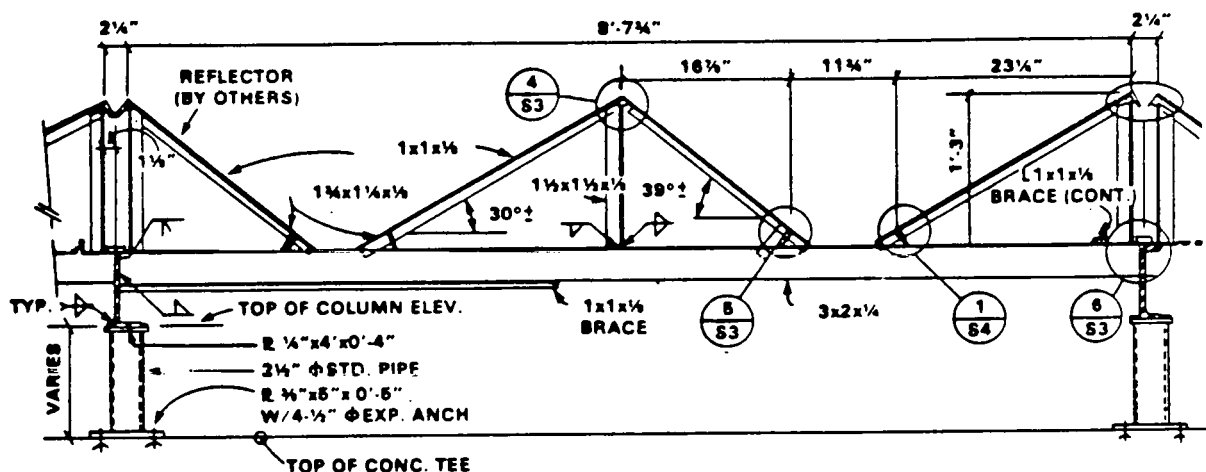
Typical N-S Cross Section, Looking West, of the Supporting Columns
